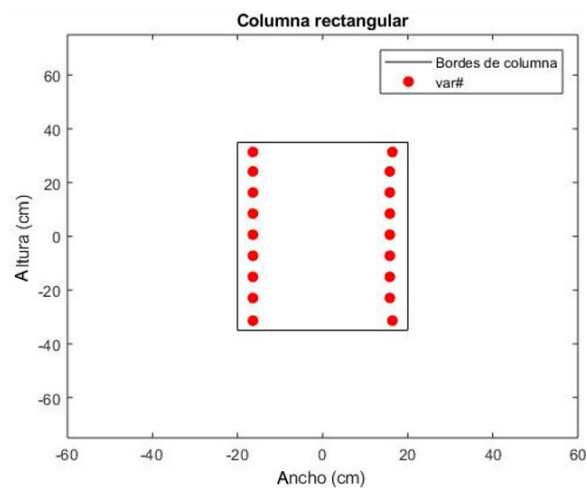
Reinforced concrete cross section for a designed rectangular column.
